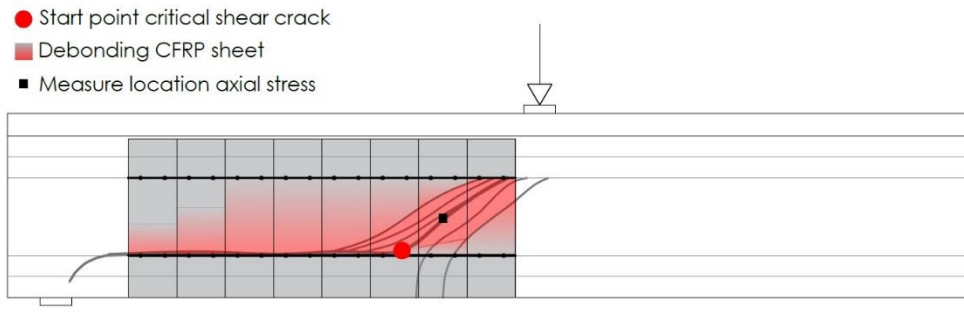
Crack pattern and CFRP debonding specimen I-VA-S0-SP3 at load step 59
